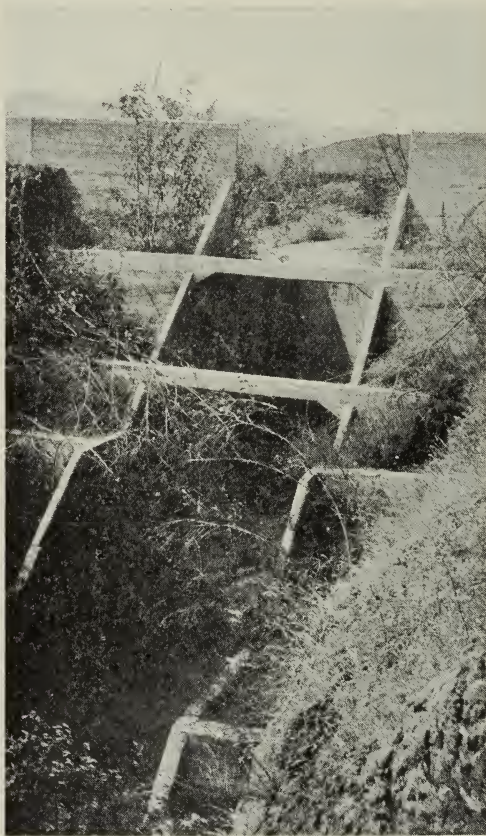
A deep barranca in Ventura County is being reclaimed by this concrete check dam. Such structures are expensive and require considerable engineering ability to design. Should such a structure fail it might endanger both life and property.
